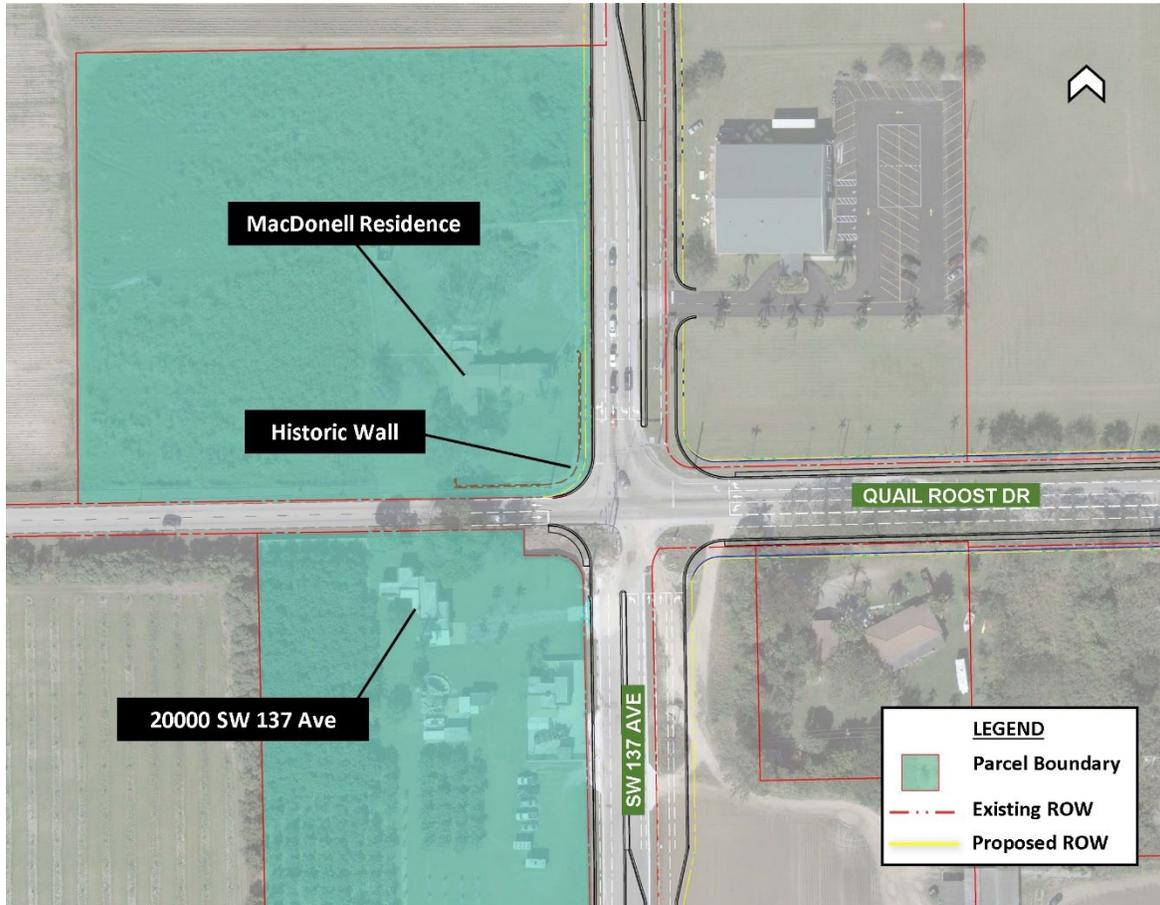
Avoidance Alternative 1 at SW 137th Avenue Intersection
